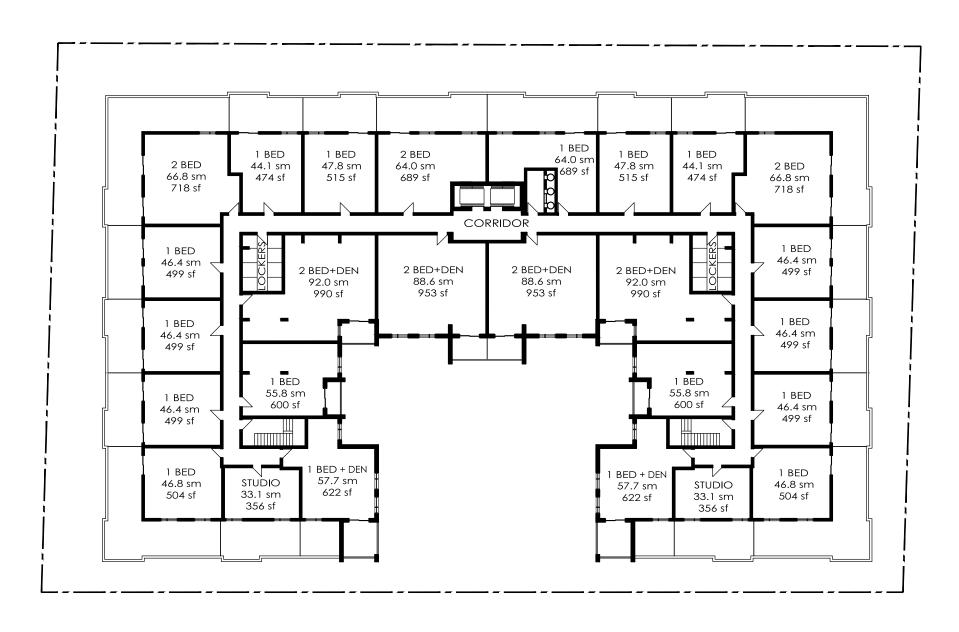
Fourth Floor Plan prepared by Lintack Architects Inc.
